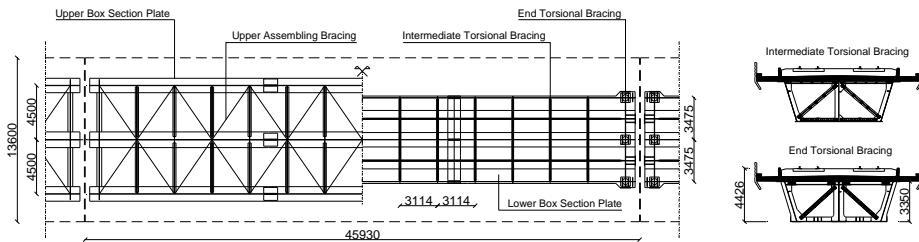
Plan view and deck cross-sections of Sesia viaduct.
